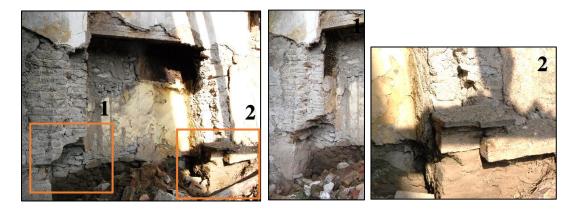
Fireplaces with plain front face made of brick (Type 1B) (left); timber boards located on the timber lintels of masonry wall at the springing line level of arch (middle, right) (Yenice N. b. block-lot: 521-12; right, Camikebir N. b. block-lot: 186-10)
